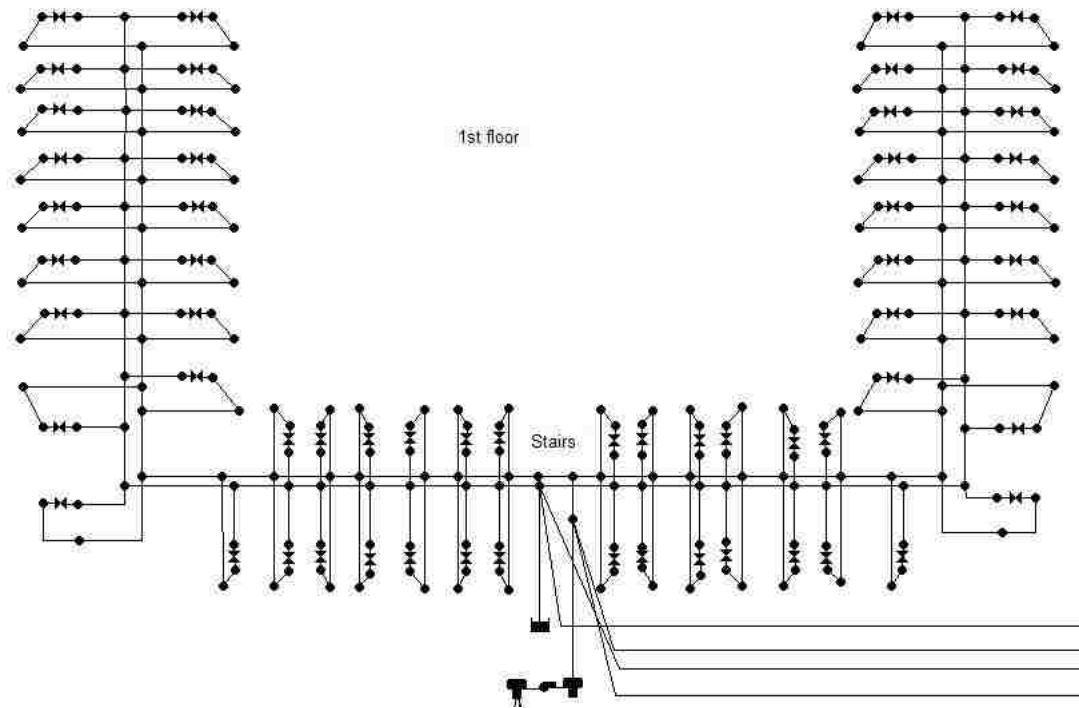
EPANET 2 Layout for One Floor of the Apartment Building
